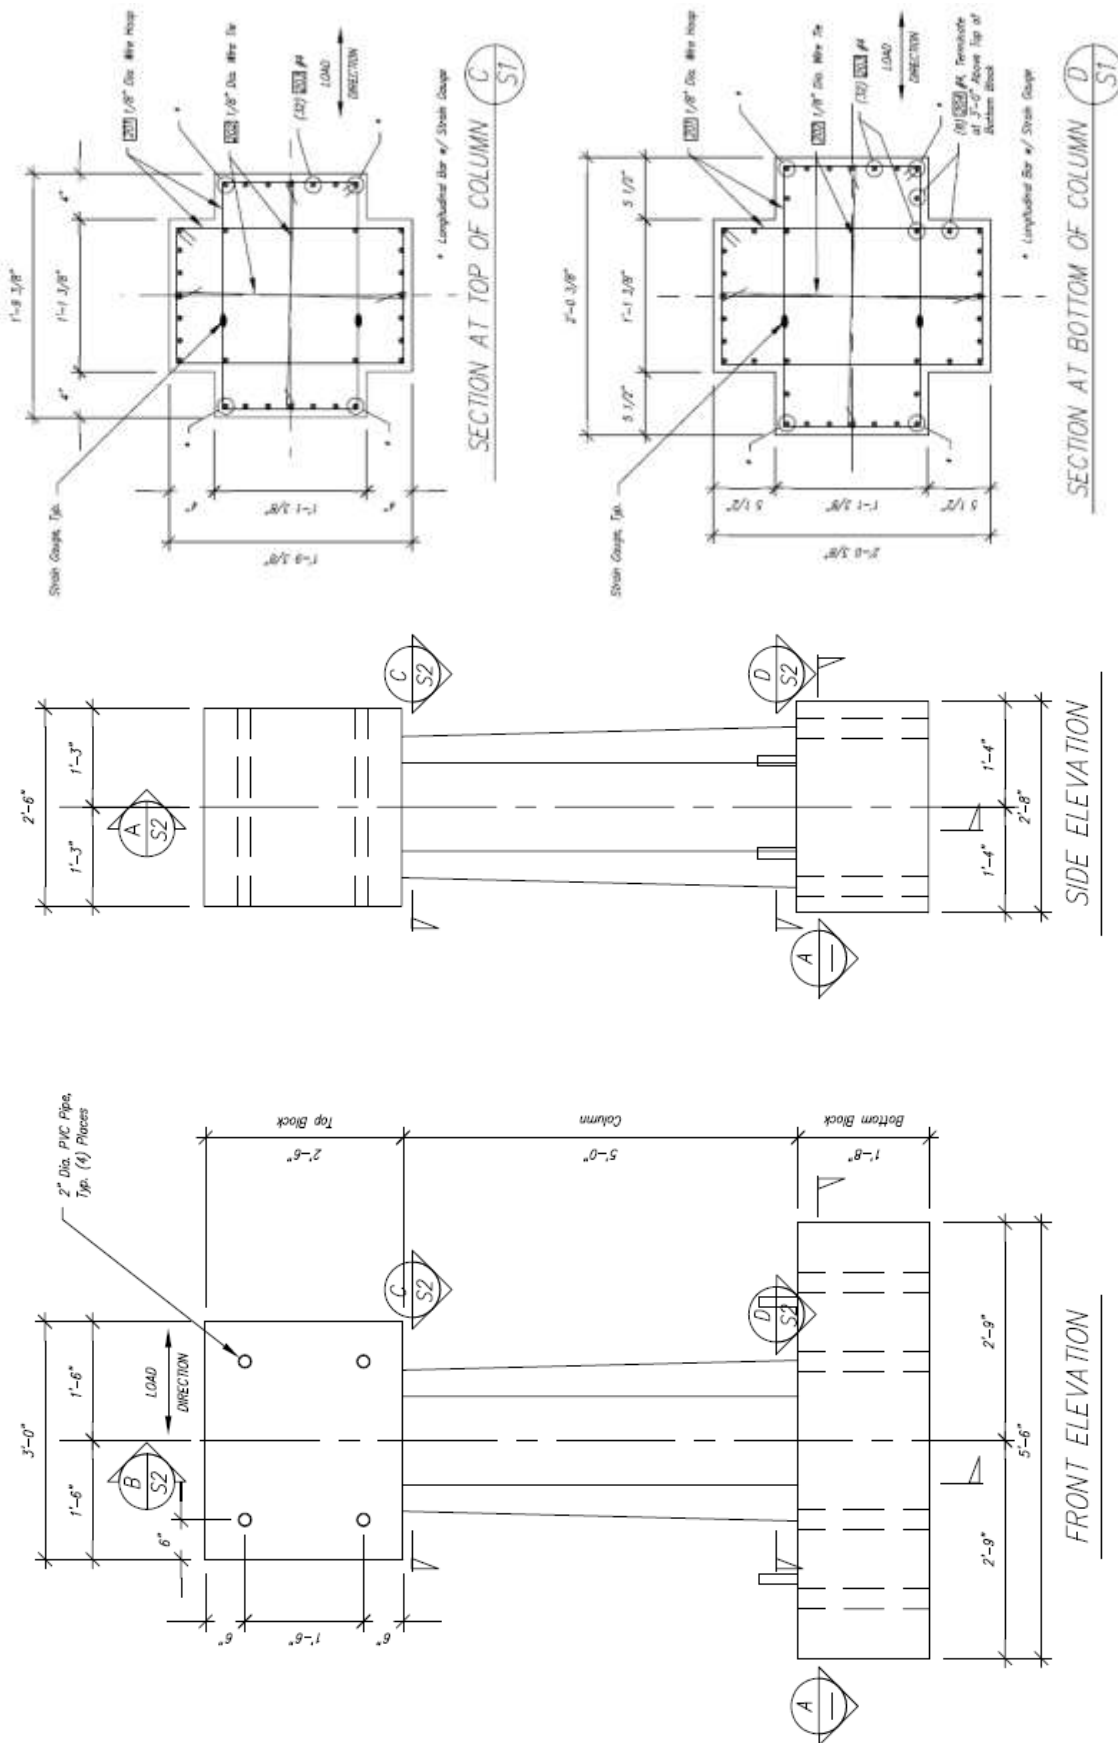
Solid Column Specimen Details (1 in. = 25.4 mm)
